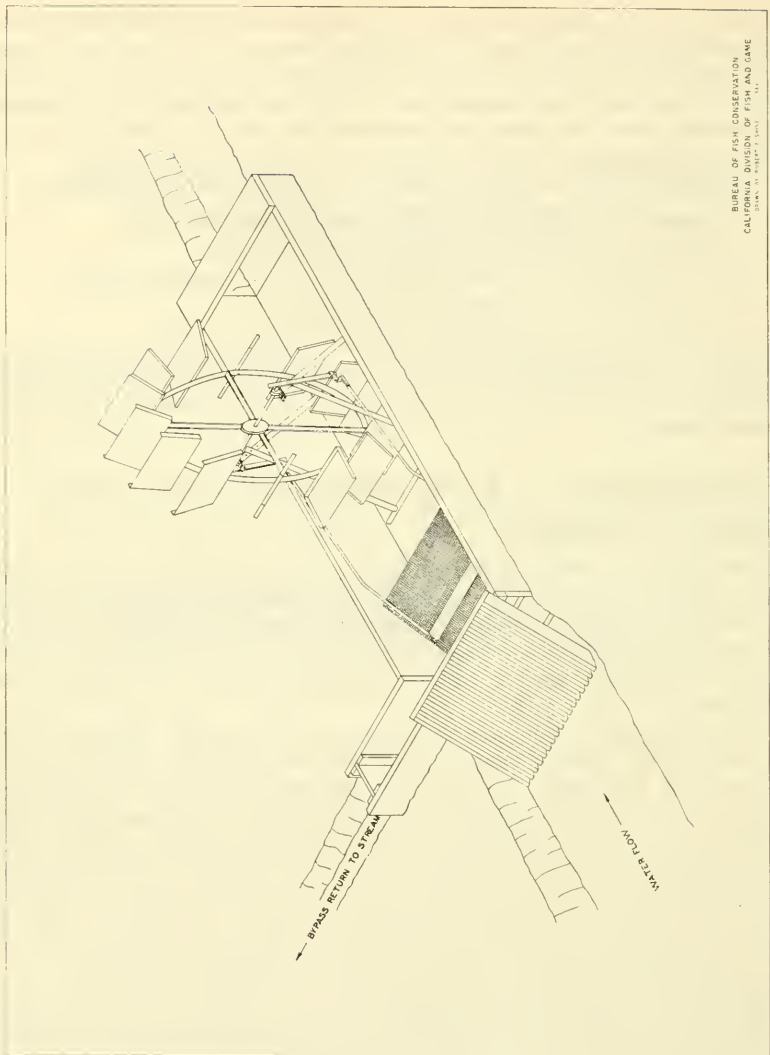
View of perforated plate fish screen with direct drive cleaner assembly
